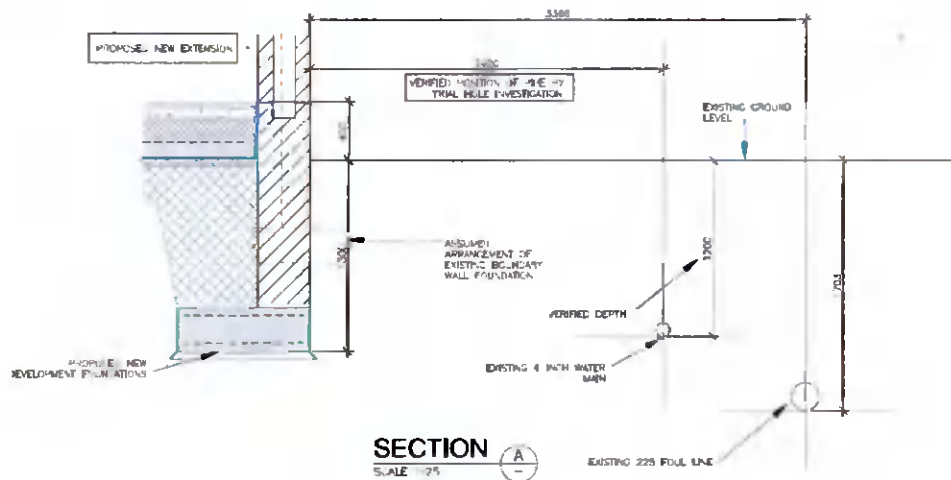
Section through existing boundary wall showing levels for existing water main and foul sewer
